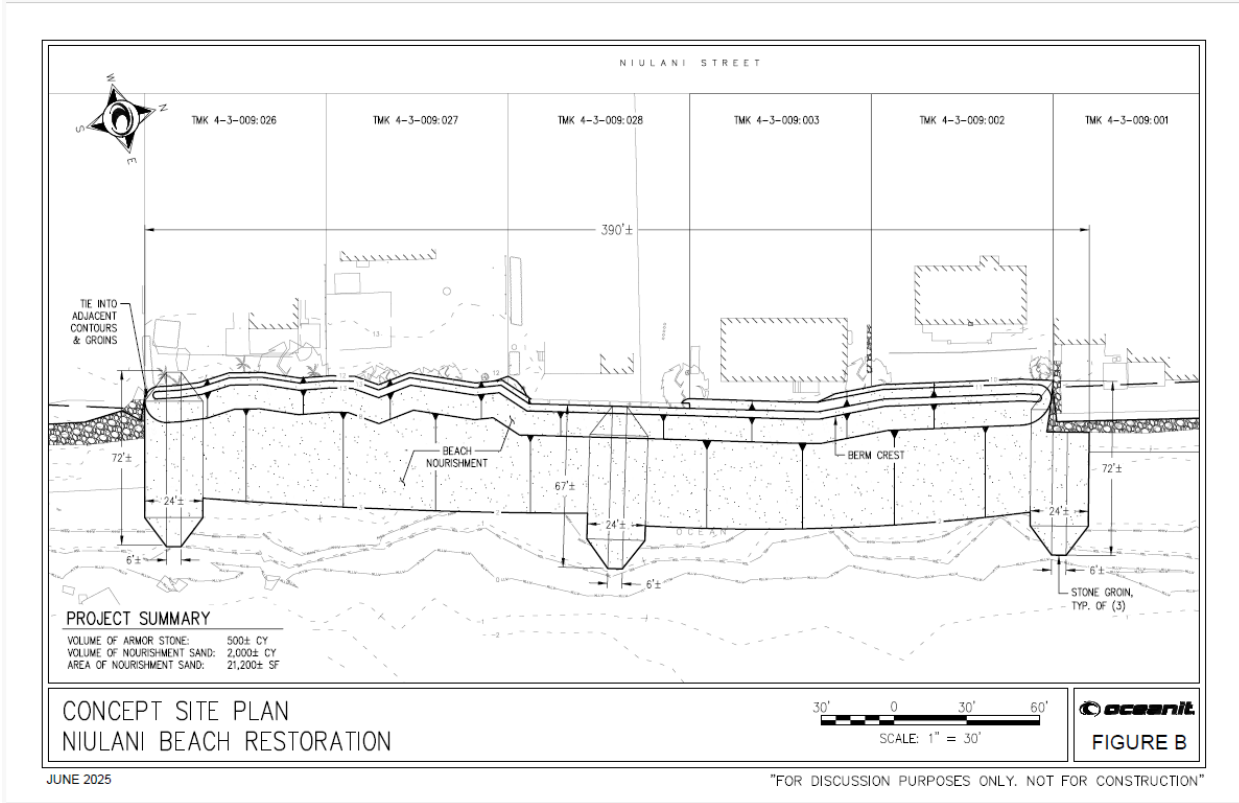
Conceptual design of beach nourishment fill and small retention structures
